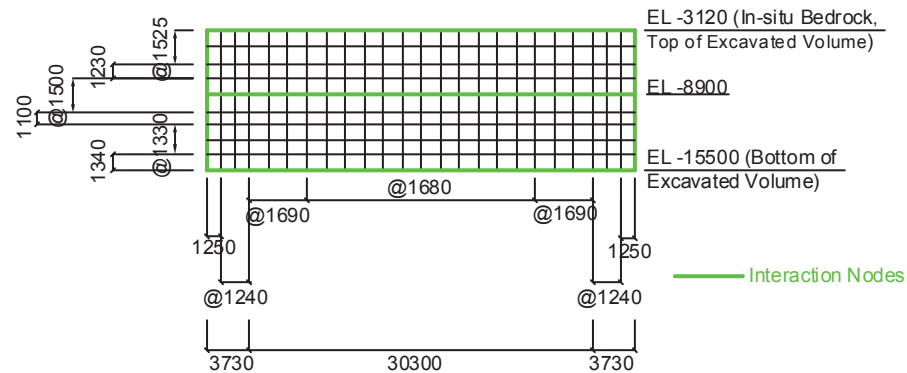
(f) Elevation C-C' Excavated Volume Model (PE)
